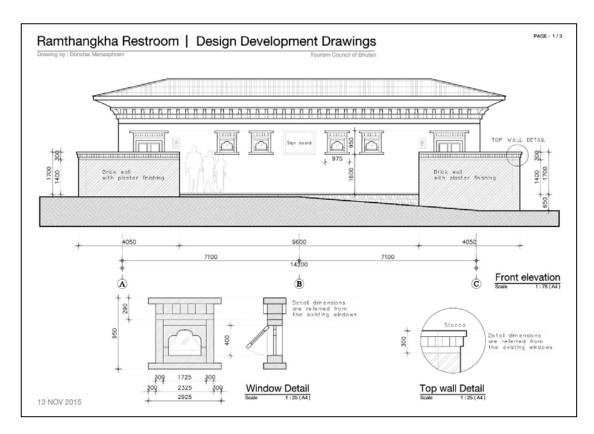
Renovation drawings of Ramthangkha (Taktsang base) restrooms
